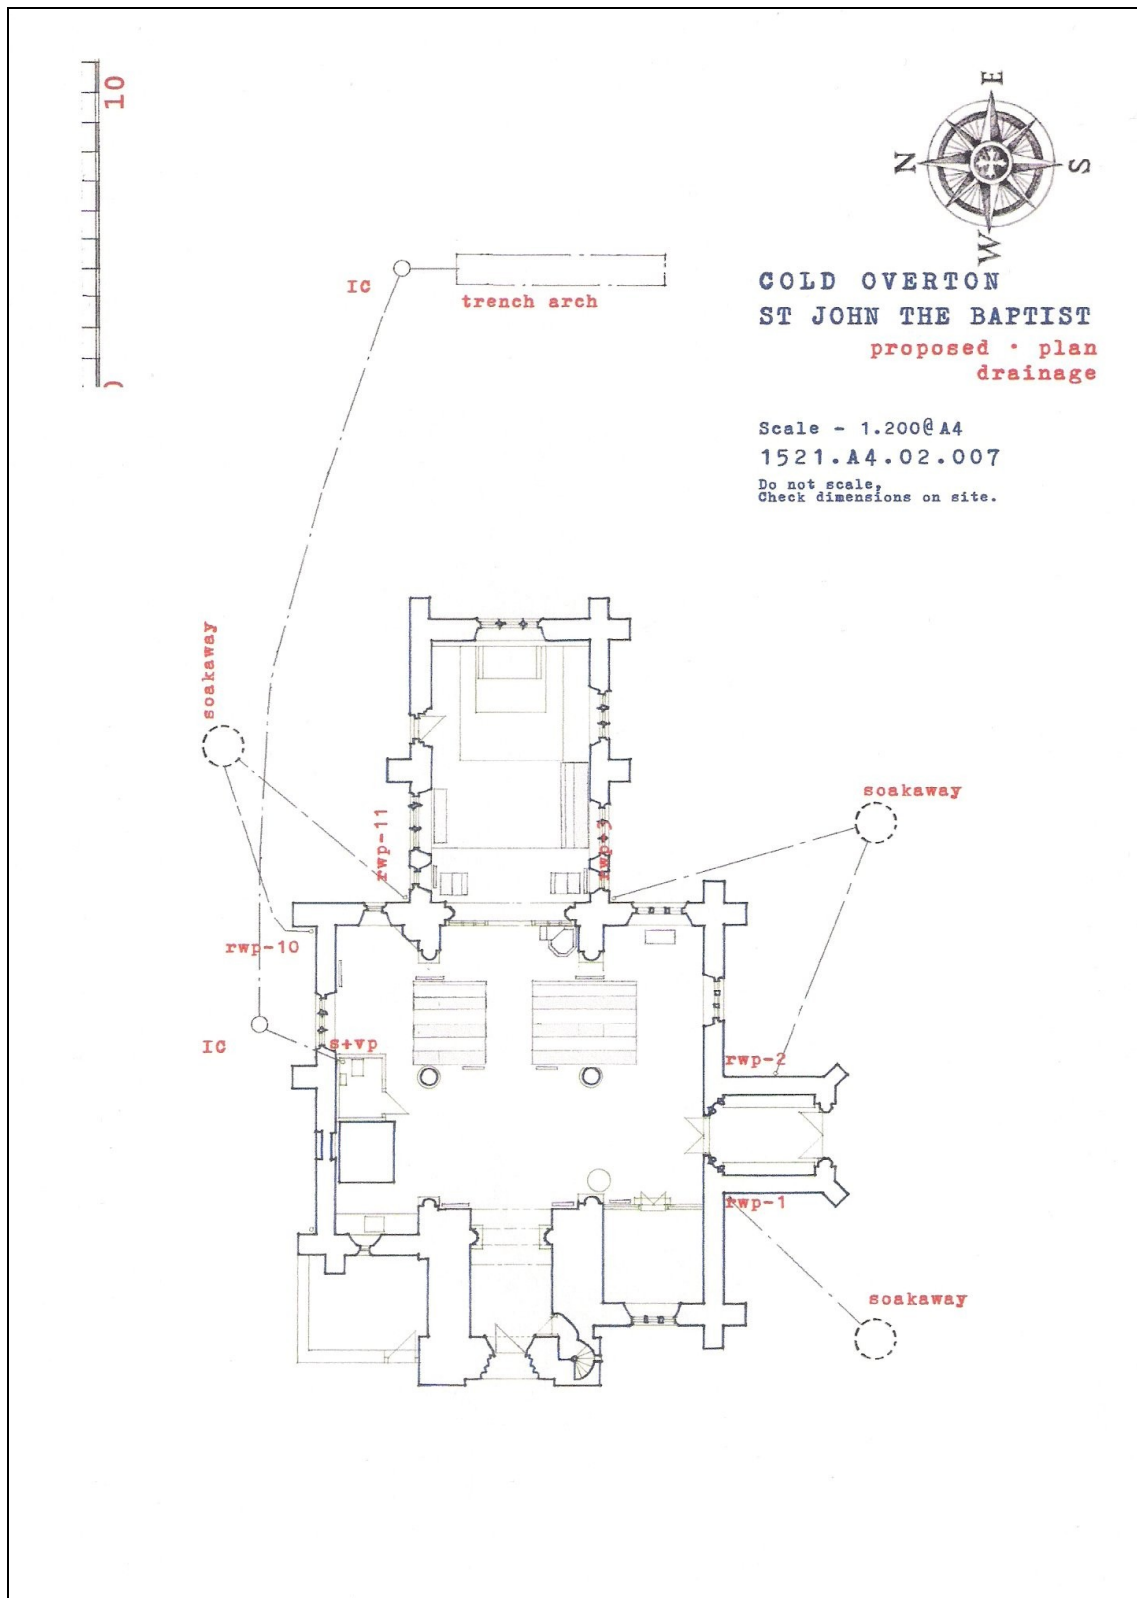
Plan showing proposed location of trench arch, soakaways and drains.
